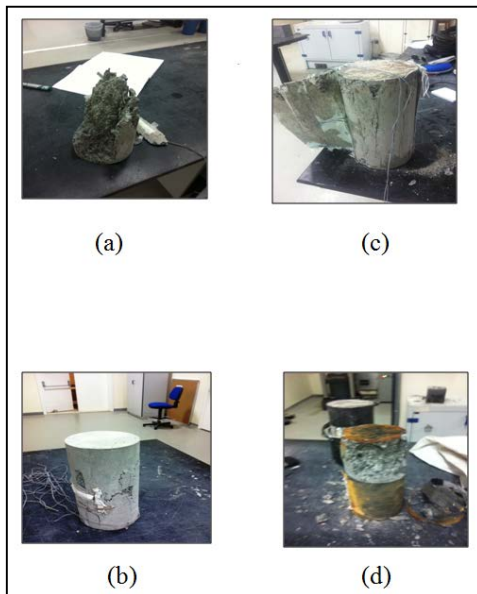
Failure modes: (a) Cone failure, (b) Border failure, (c) De-bonding failure, (d) Delamination failure
